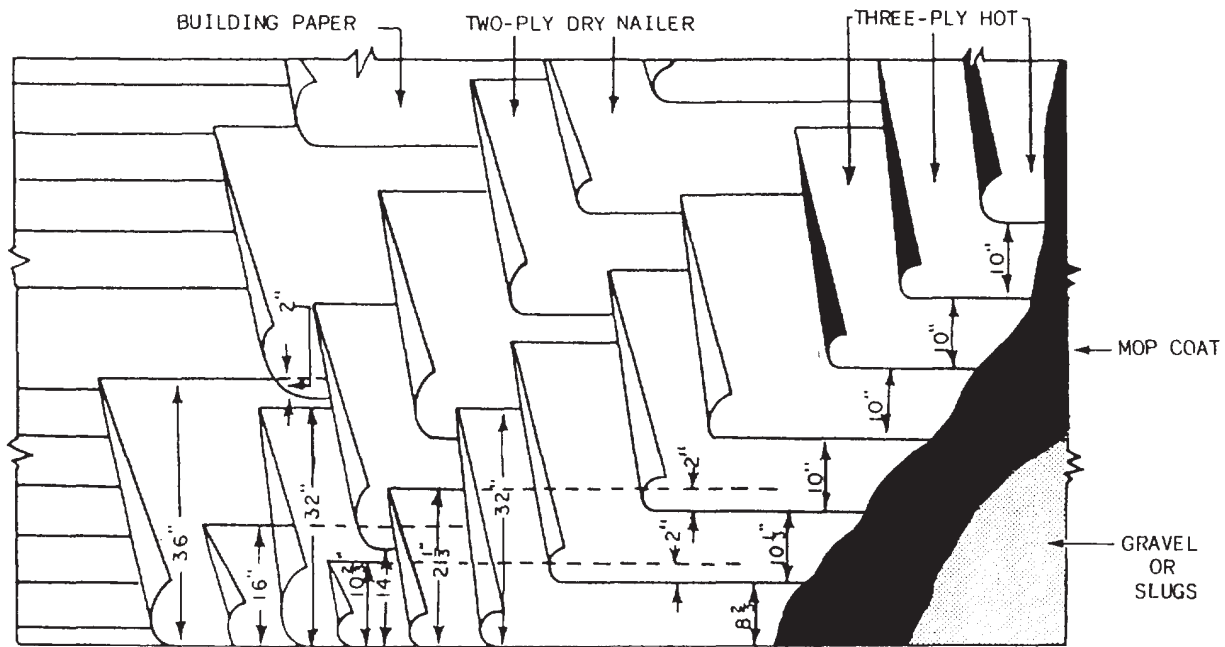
A typical building paper and felt on five-ply built-up roof.
